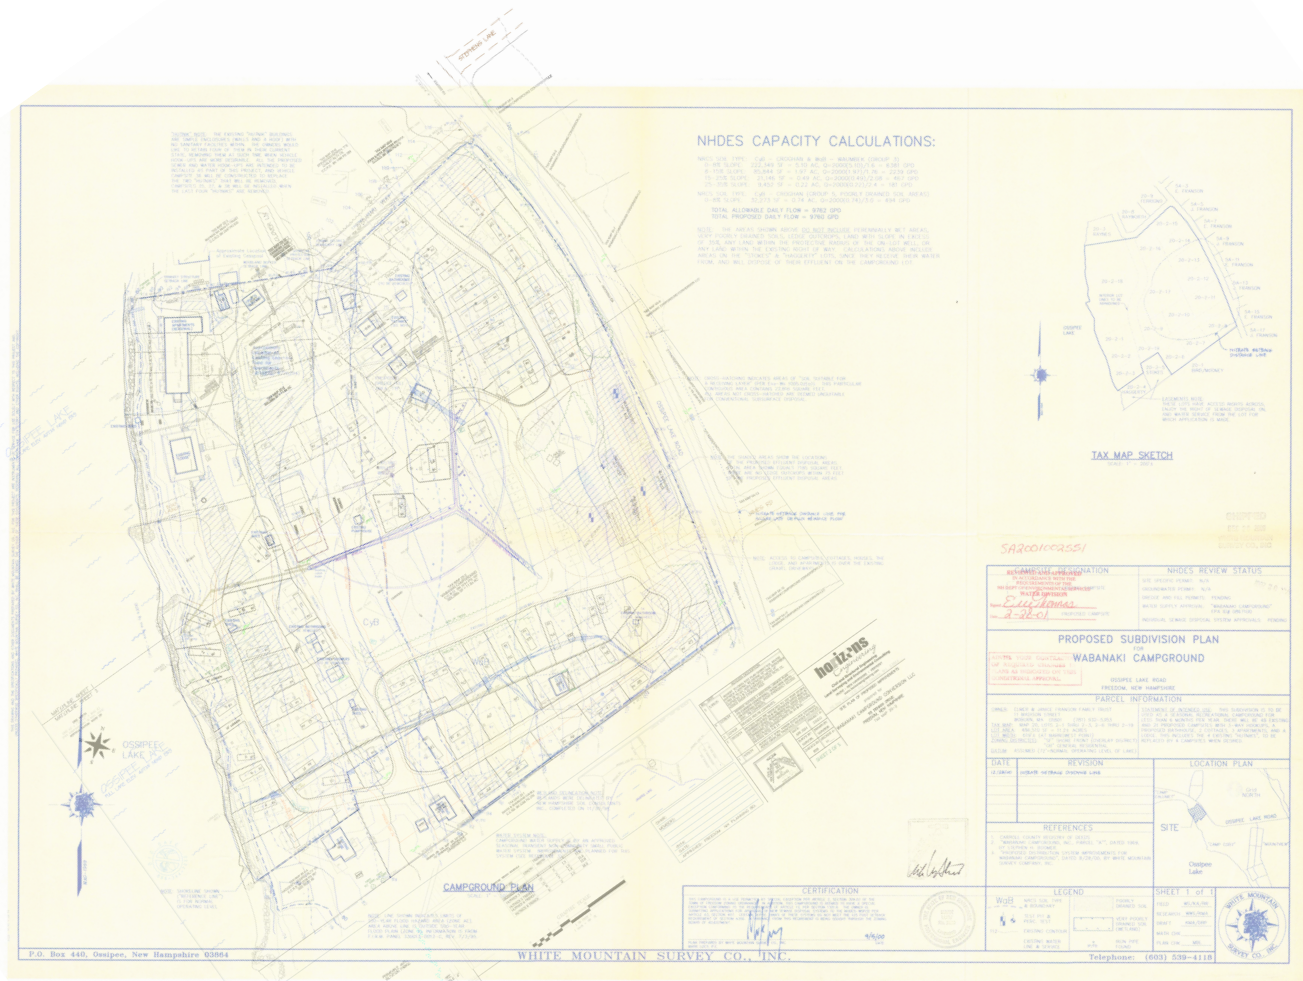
Horizons Plan Under 2000/2001 White Mountain Survey State Subdivision Plan- White Mountain Plan Partially Transparent
